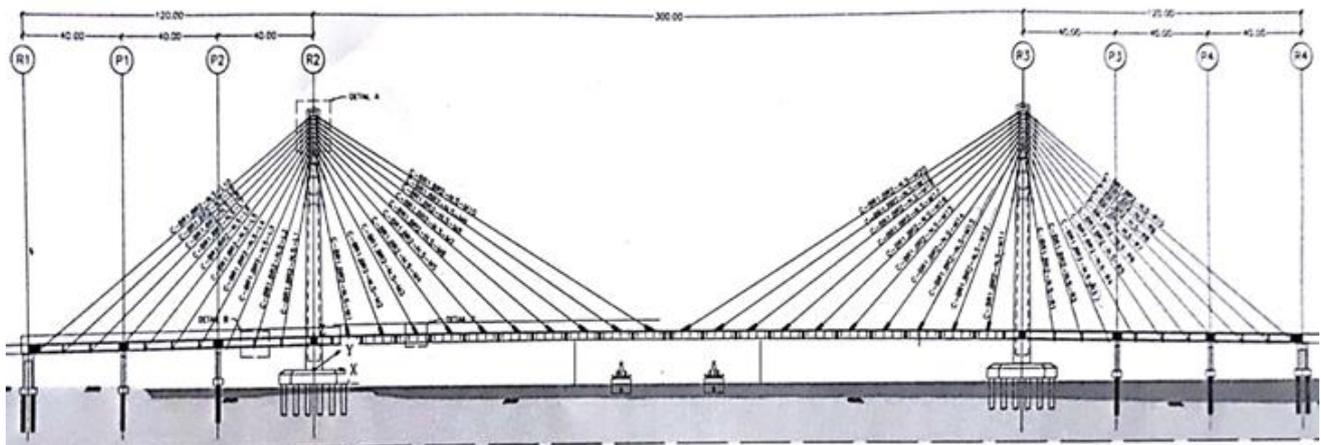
Layout of Cable Stayed Bridge. (Elhosary 2019).
